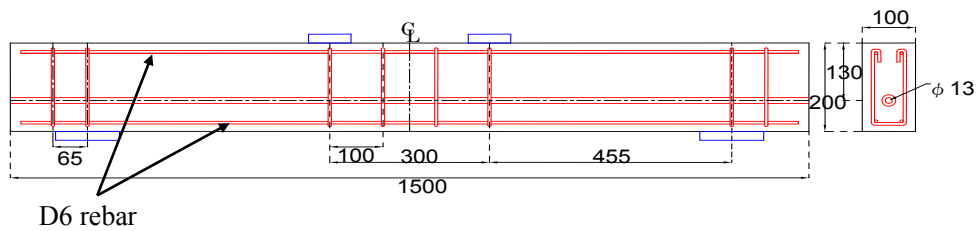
Beam of B series (Designed failure mode: Diagonal tension failure, unit: mm)
